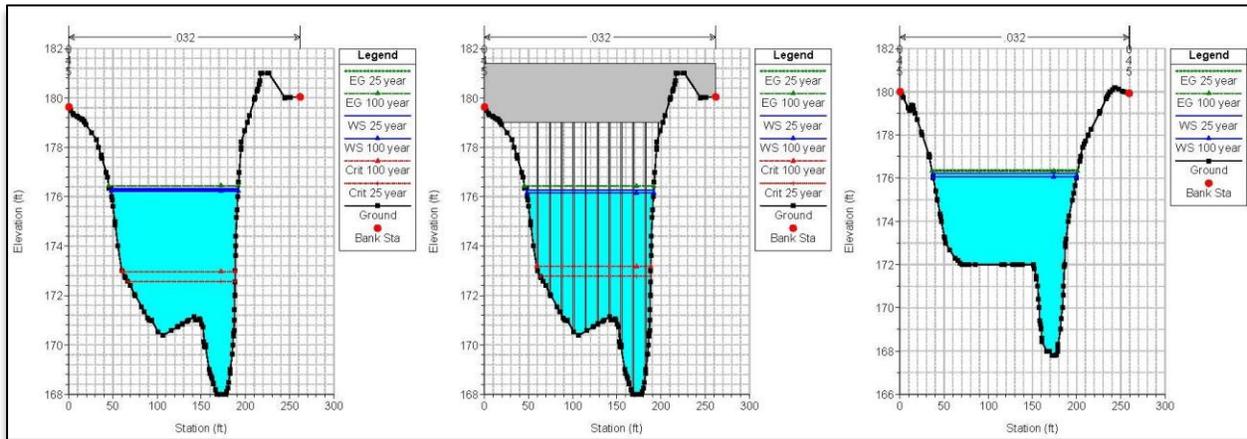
HEC-RAS Upstream, Bridge, and Downstream Cross Sections
